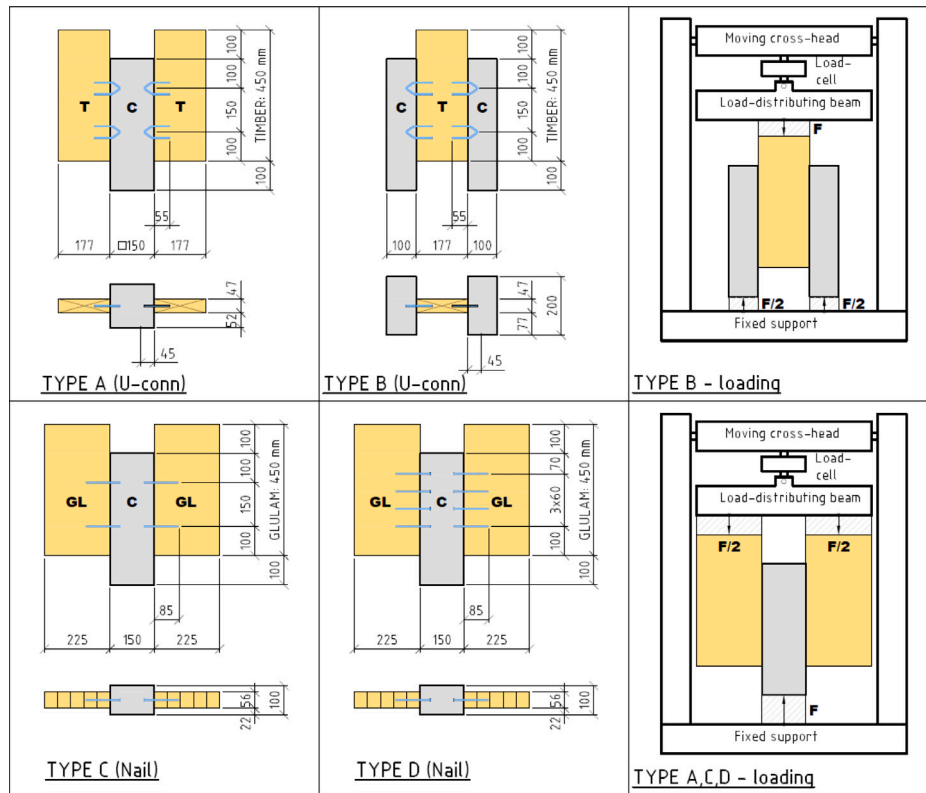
The test specimens used for push-out tests with U-shaped connectors (top) and nails (bottom). To the right, the load application principle through a moving crosshead and fixed supports is shown for test specimen type B at the top, and types A, C and D at the bottom. C = Concrete, GL = Glulam timber, T = structural Timber, F = Force.
